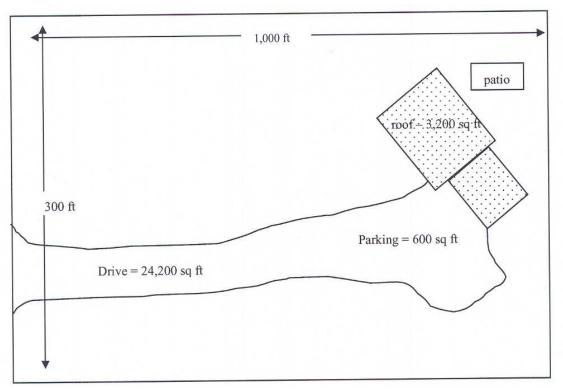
Sample site plan that meets exemption for post construction stormwater plan
